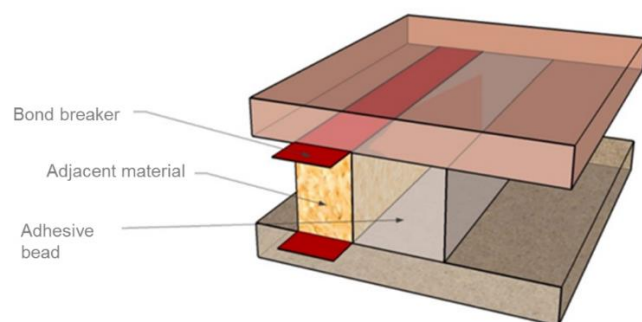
Test specimen Type I with a bond breaker.
